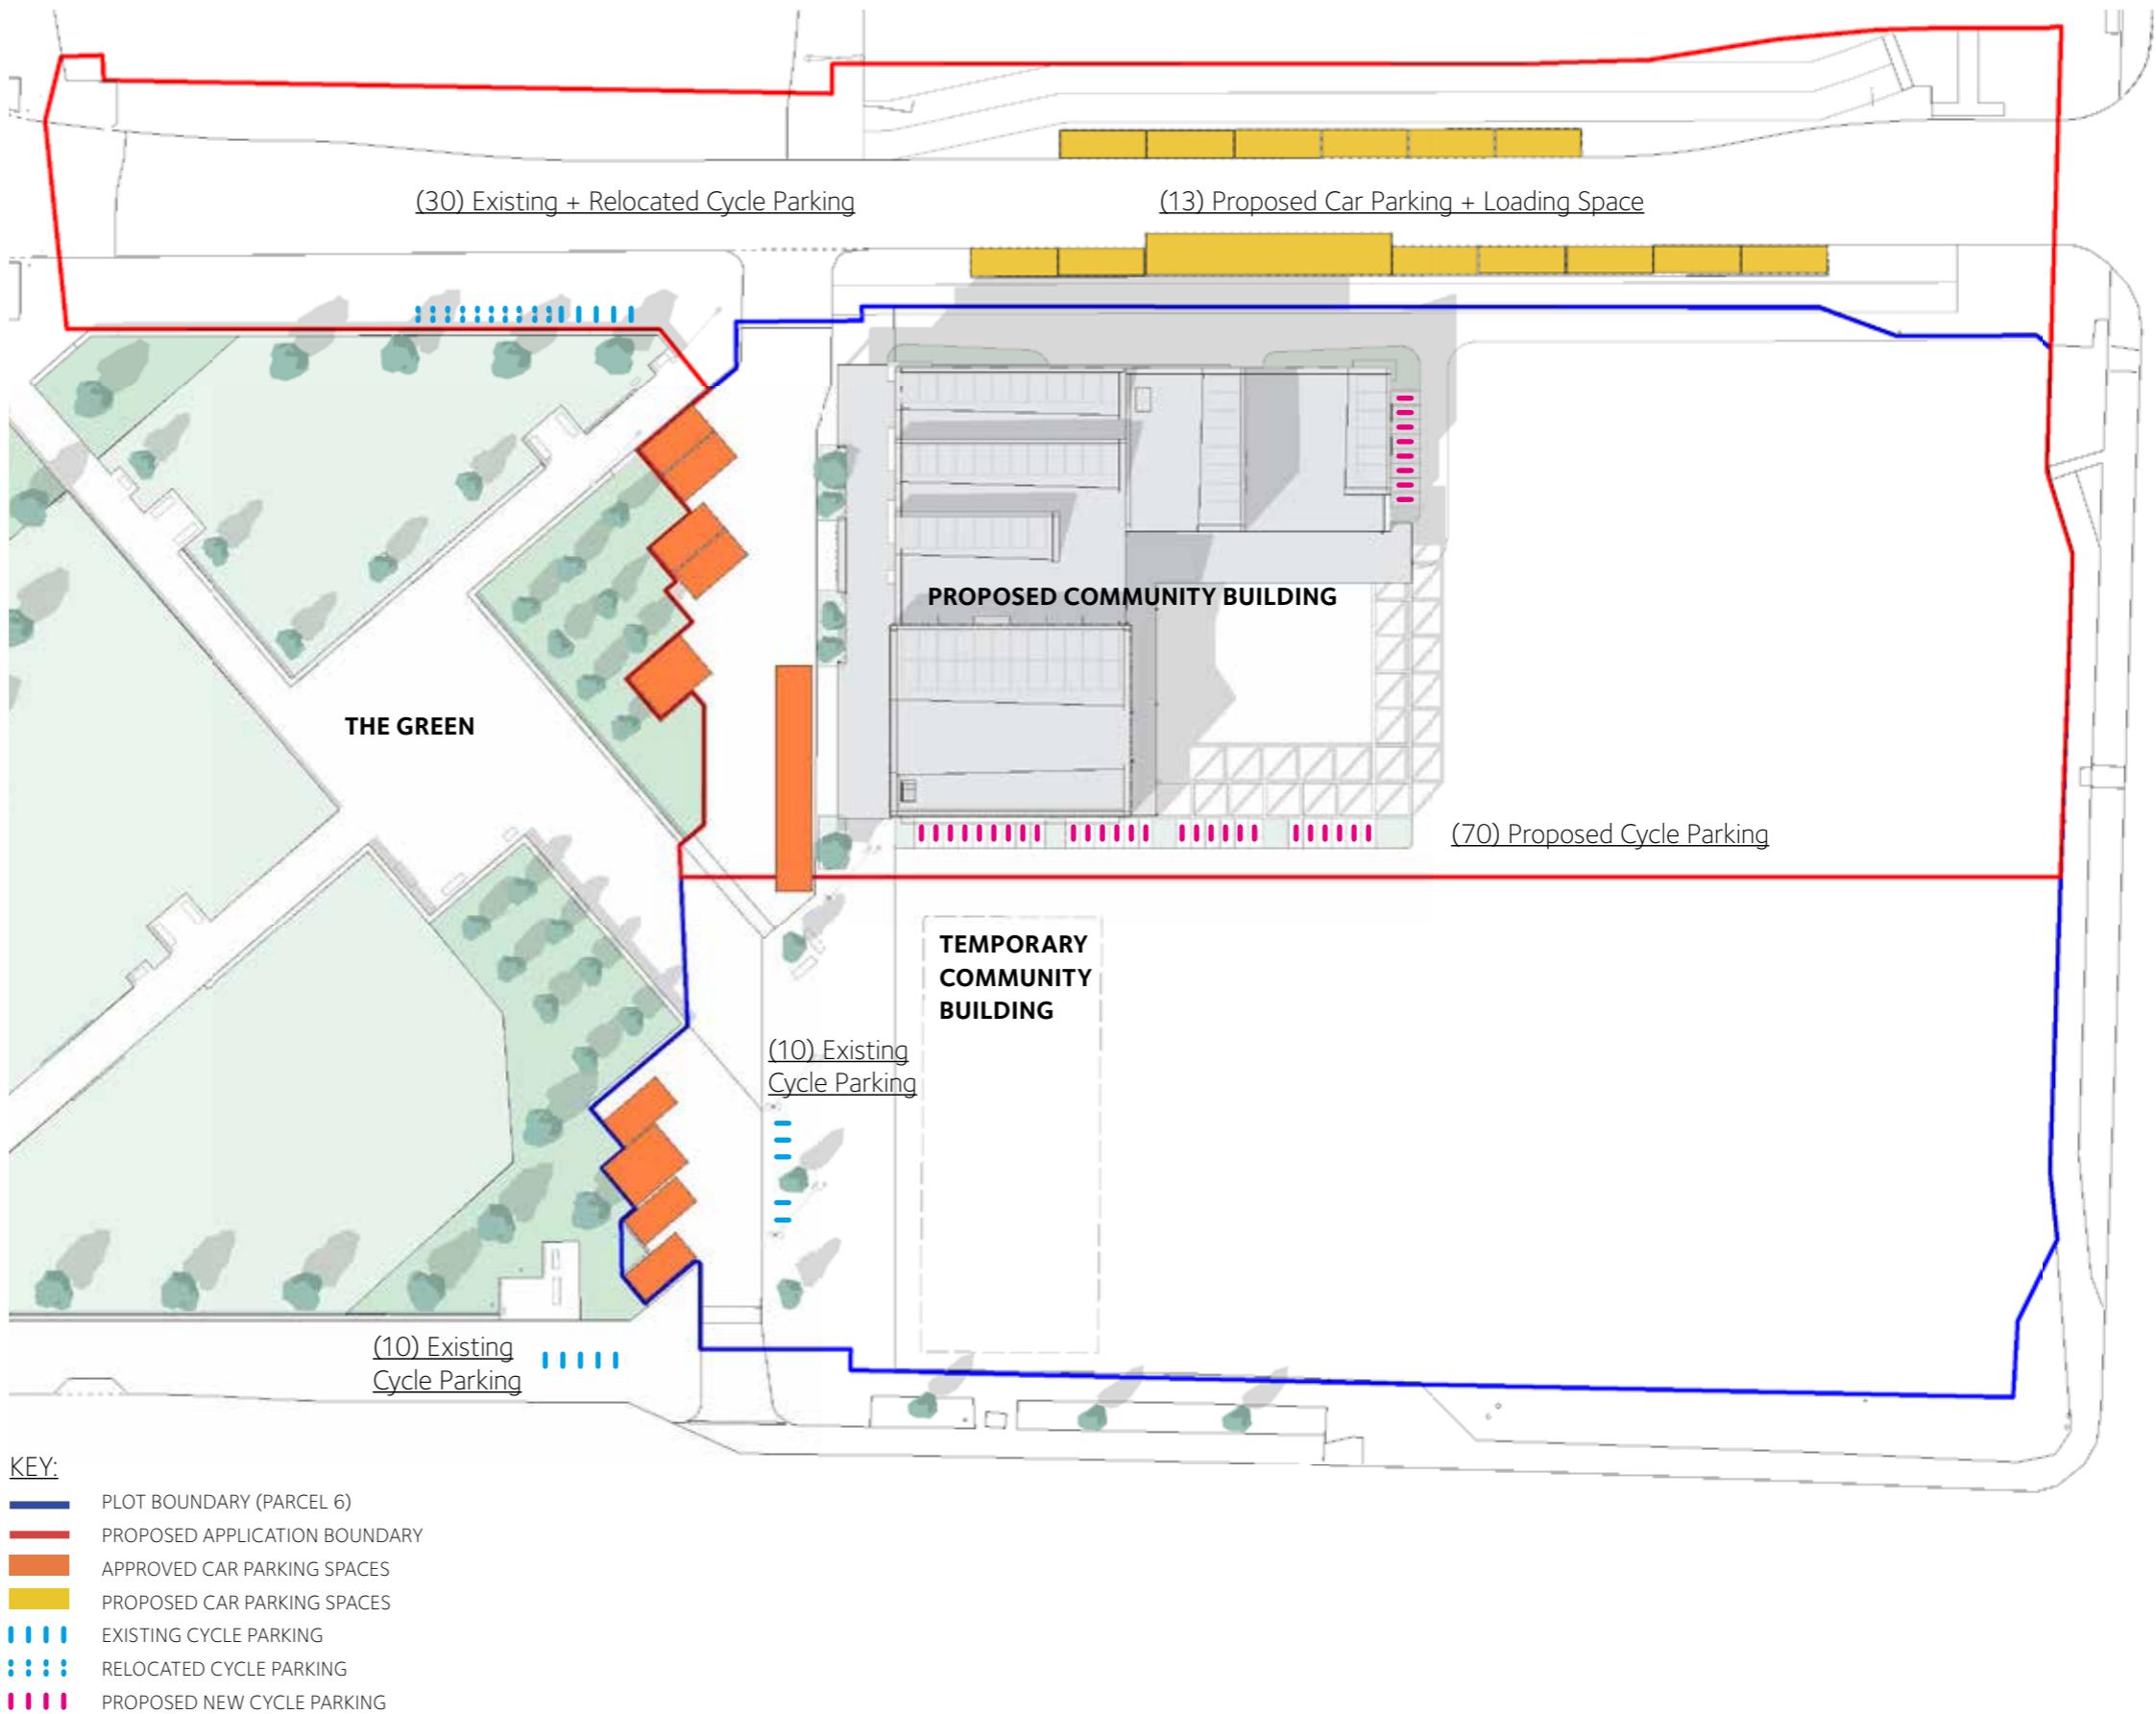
A Cycle and Car Parking Plan (NTS)
